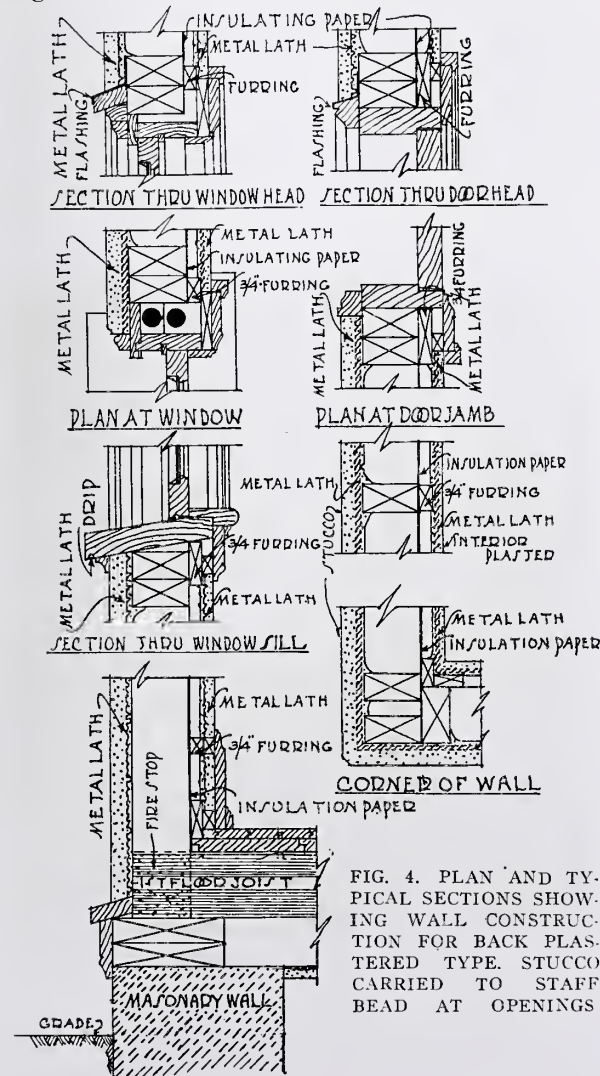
PLAN AND TYPICAL SECTIONS SHOWING WALL CONSTRUCTION FOR BACK PLASTERED TYPE. STUCCO CARRIED TO STAFF BEAD AT OPENINGS
